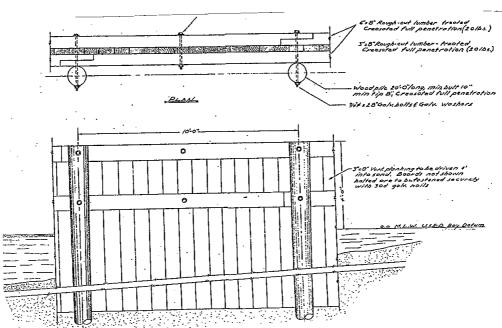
Cross-Section, Plan View of Timber-Pile Groins on Virginia Key
